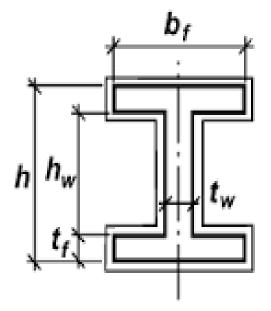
Welded I-section to find out the compression and shear capacity
